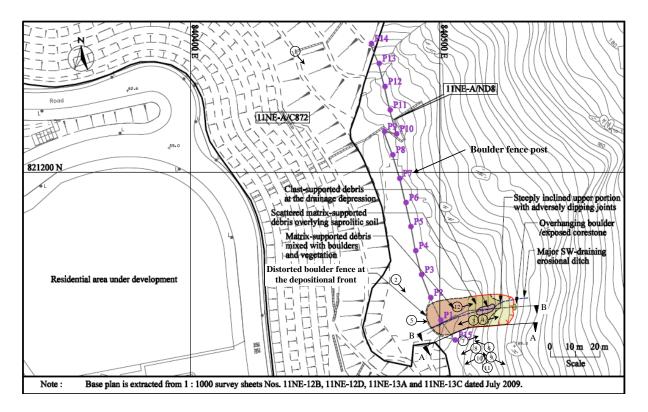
Locations of the Landslide Site and Flexible Rockfall Barrier No. 11NE-A/ND8
